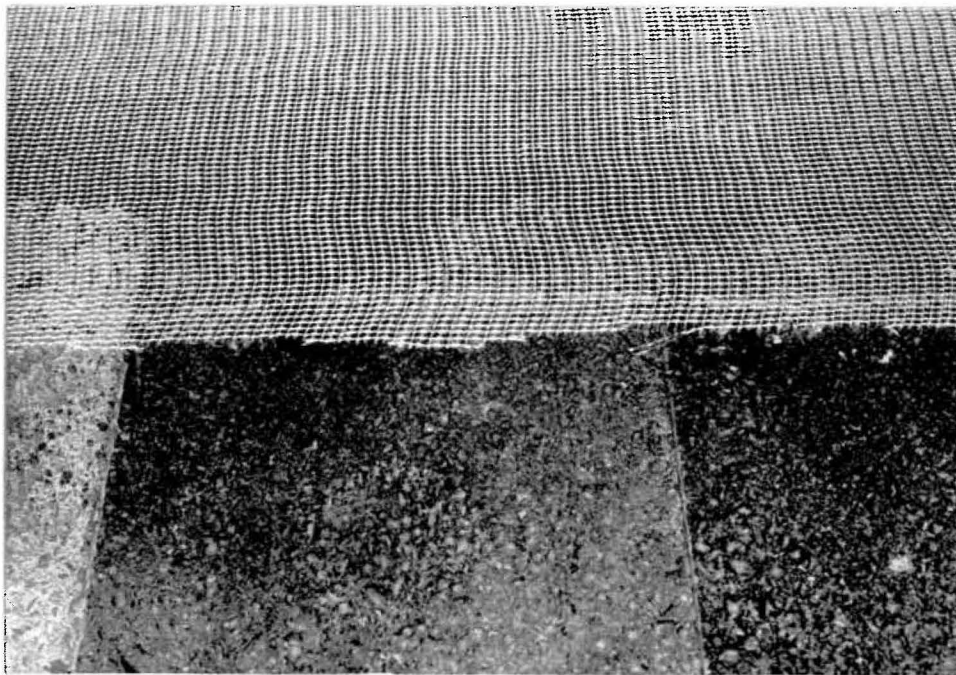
High modulus fabric placed over cracked pavement.
